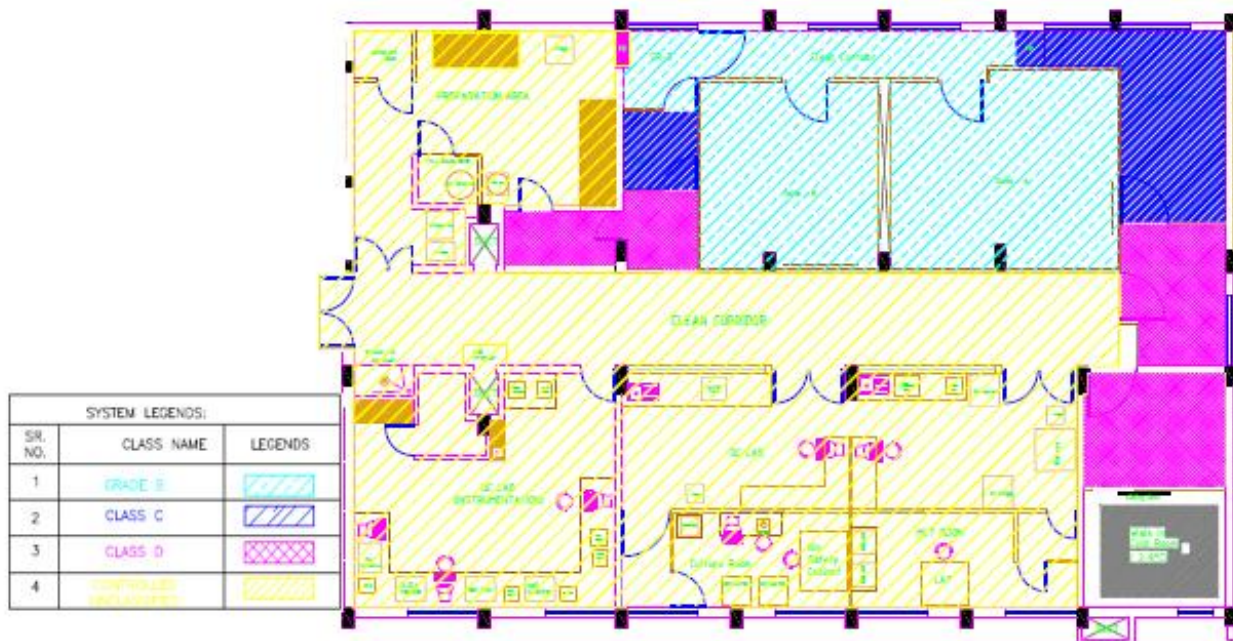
Floor plan of the GMP manufacturing facility at Manipal
